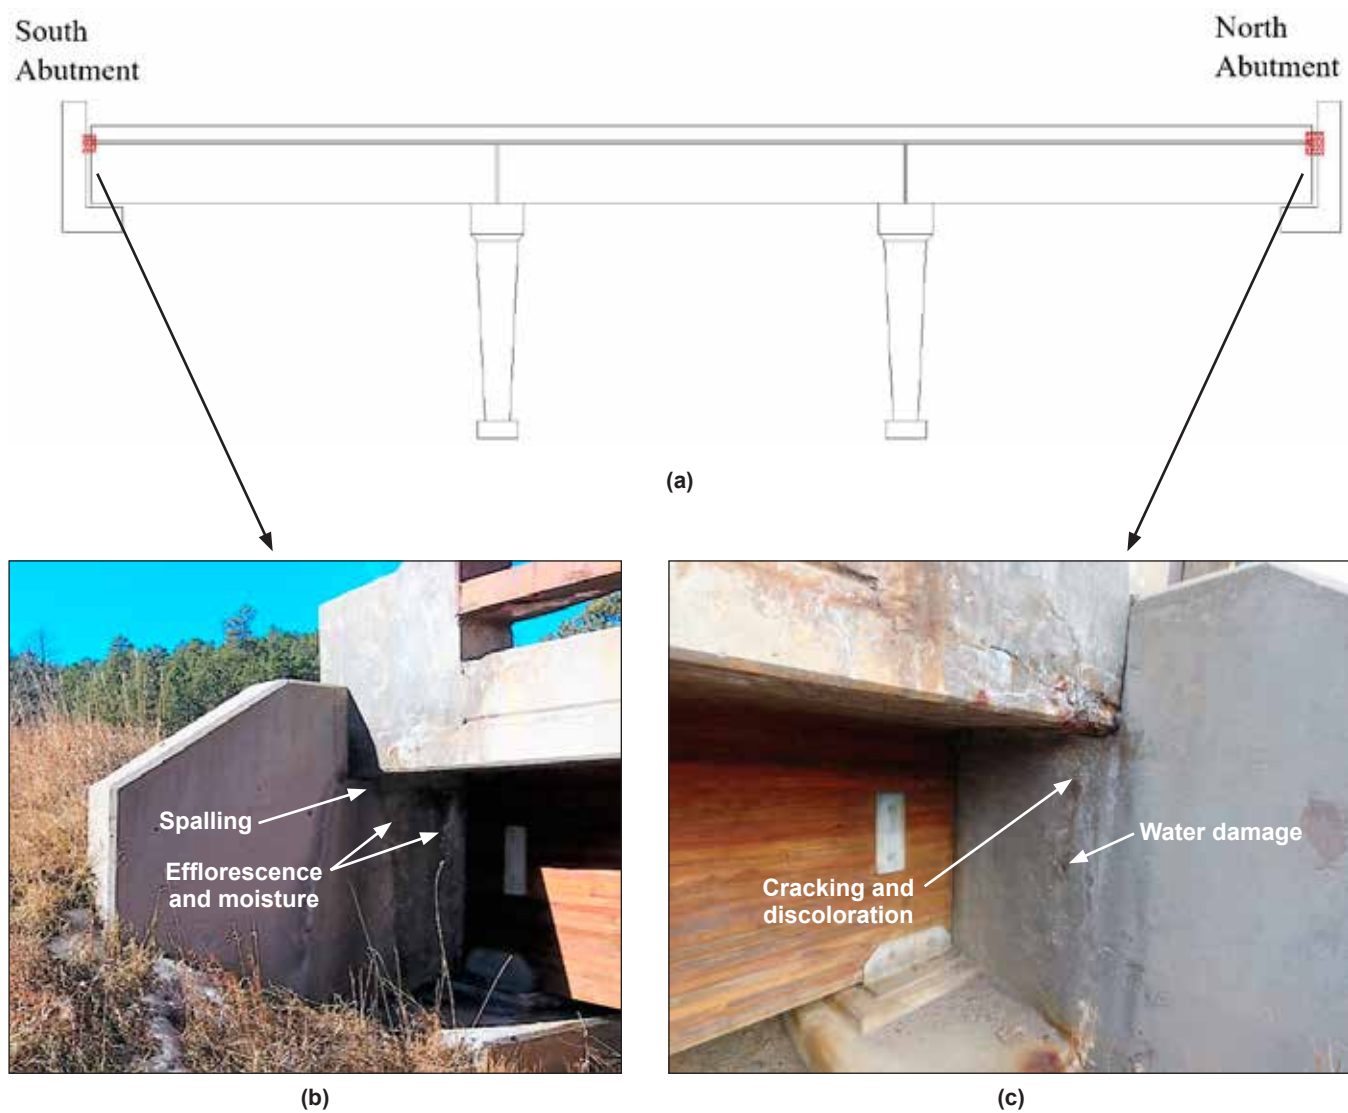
Sample damage on abutment: (a) damage location on abutment; (b) spalling, efflorescence, and moisture on south abutment near Girder 4; (c) cracking, discoloration, and water damage at north abutment near Girder 4.
